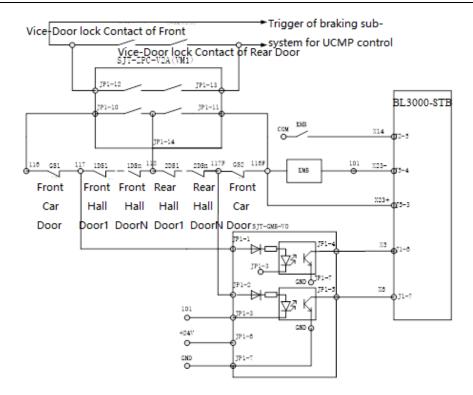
rear door mode: floor/car-door short connected detection plan (Suitable for asynchronous traction machine and combined with UCMP stop subsystem)
